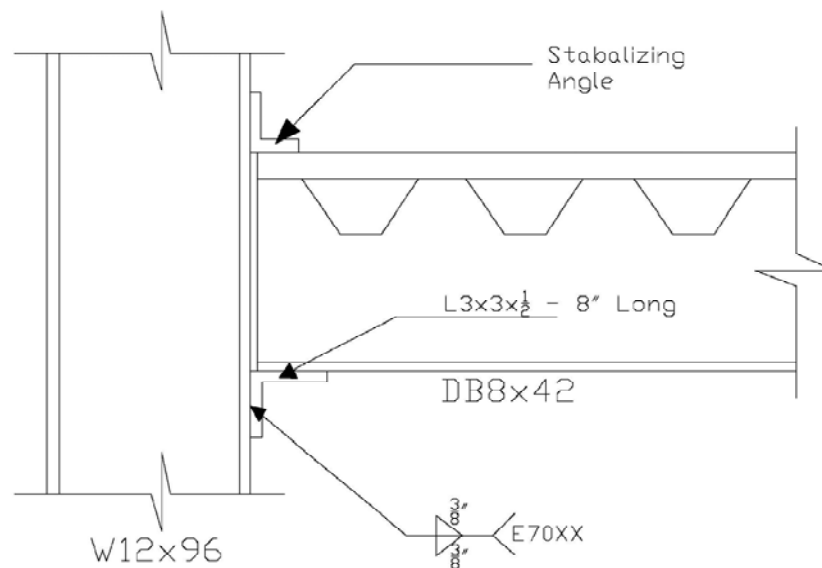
Connection detail using unstiffened seat connection at D-Beam – Column Flange location
